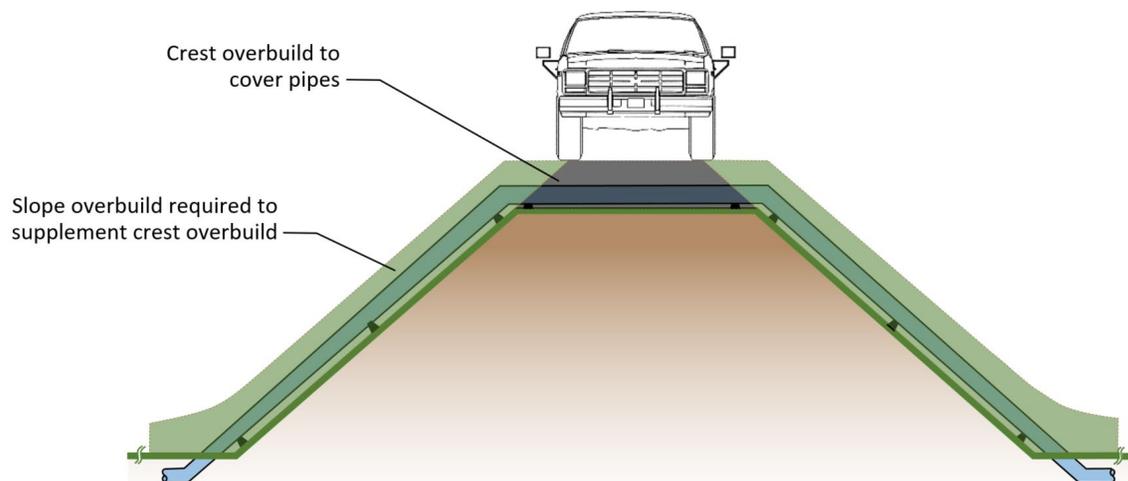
Normal crest widths (roughly 10 to 12 feet) will typically require overbuilt slopes.
